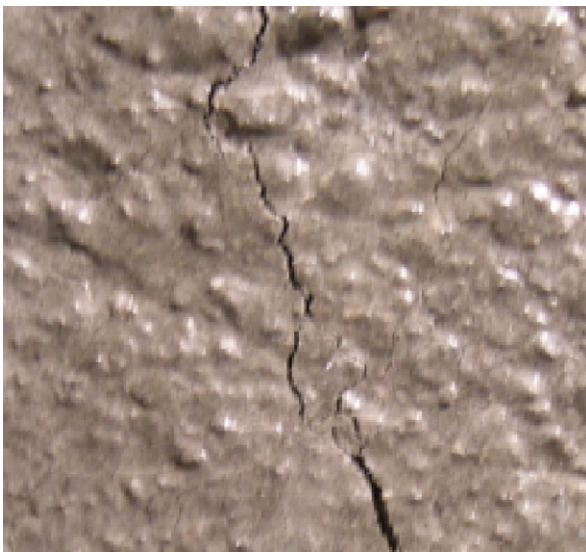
Plastic shrinkage crack in the steel fibre concrete (HST2) slab (area 75×75 mm).
